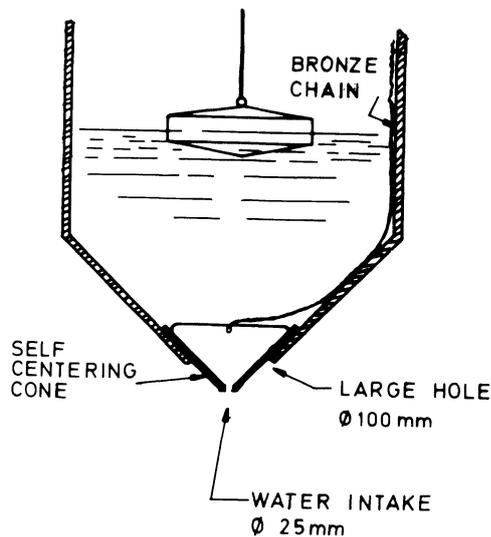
Section of hopper bottom for tube stilling well with cone and chain for cleaning out sediment deposits.
